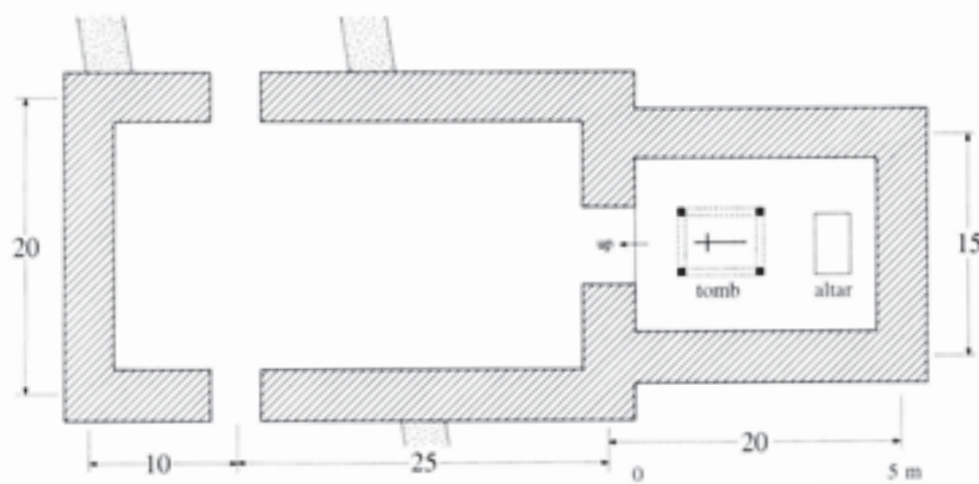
Reconstructed ground plan of St Mary's chapel showing the suggested original layout of the chancel with a centrally placed canopied tomb or shrine and an altar to the east. The design dimensions of the building, to wall-centres, are given in Roman feet. Later walls abutting to north and south are shown in outline. Scale 1:150
